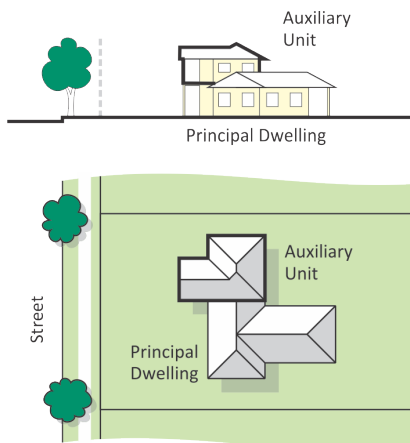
Layout of an Auxiliary Unit located above the Principal Dwelling
